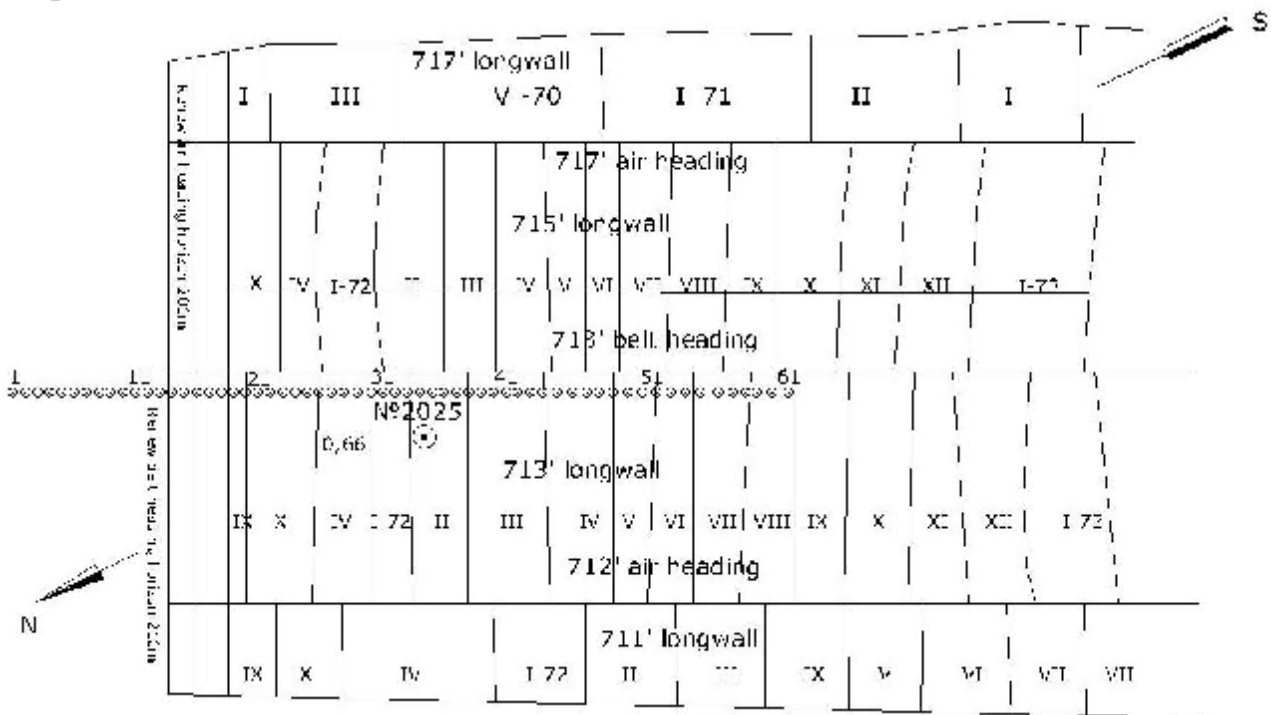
Plan of observation station 8 ("Stepnaia" mine)
